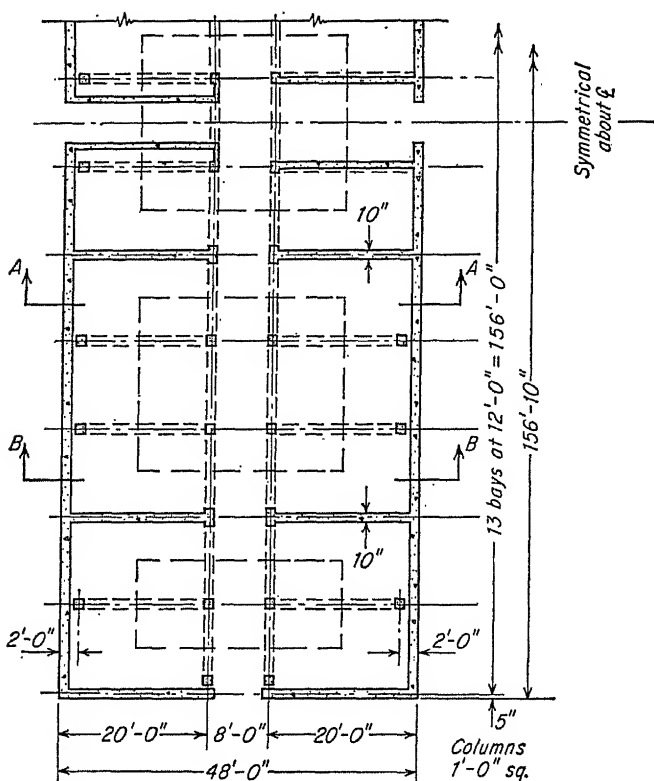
Plan of one-story reinforced-concrete shear-wall building [Chap. 1, Ref. 8].
